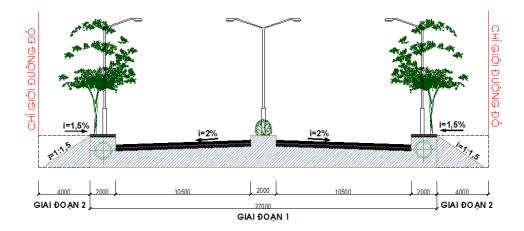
Cross section of segment 02, Tran Quang Khai road
